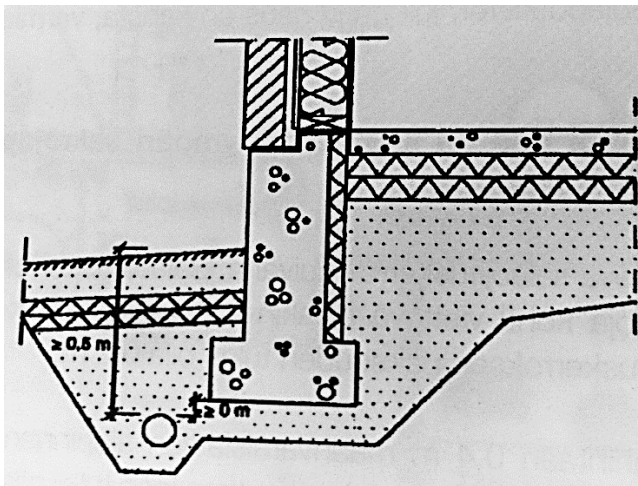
Foundation with drainage pipe and frost insulation, *Pohjarakennuksen perusteet*, p134
